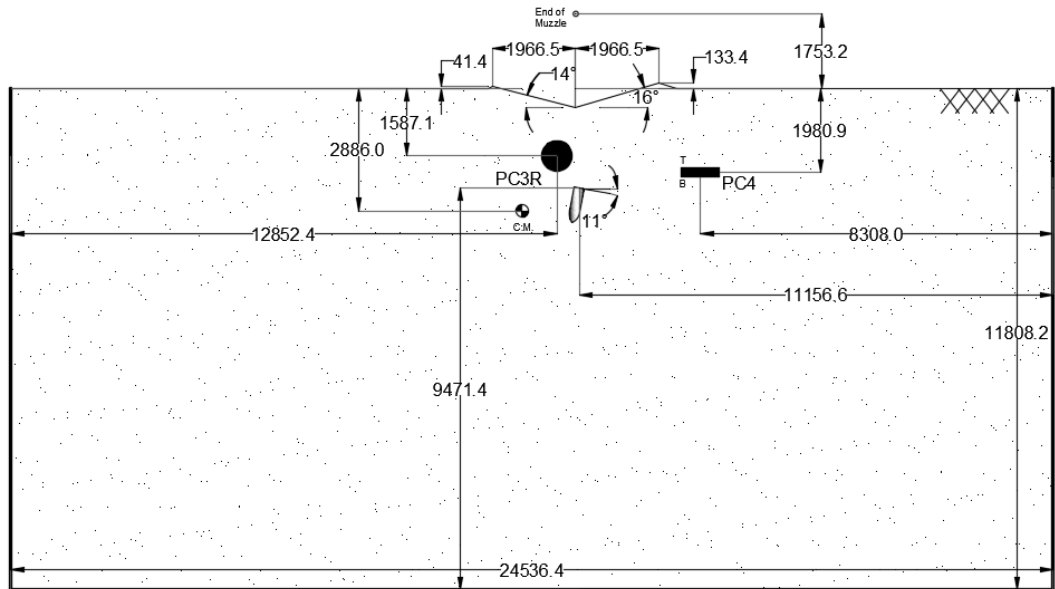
Schematic sketches of the penetrated projectile in test 2 and the formed crater: plan view (dimensions in mm)
